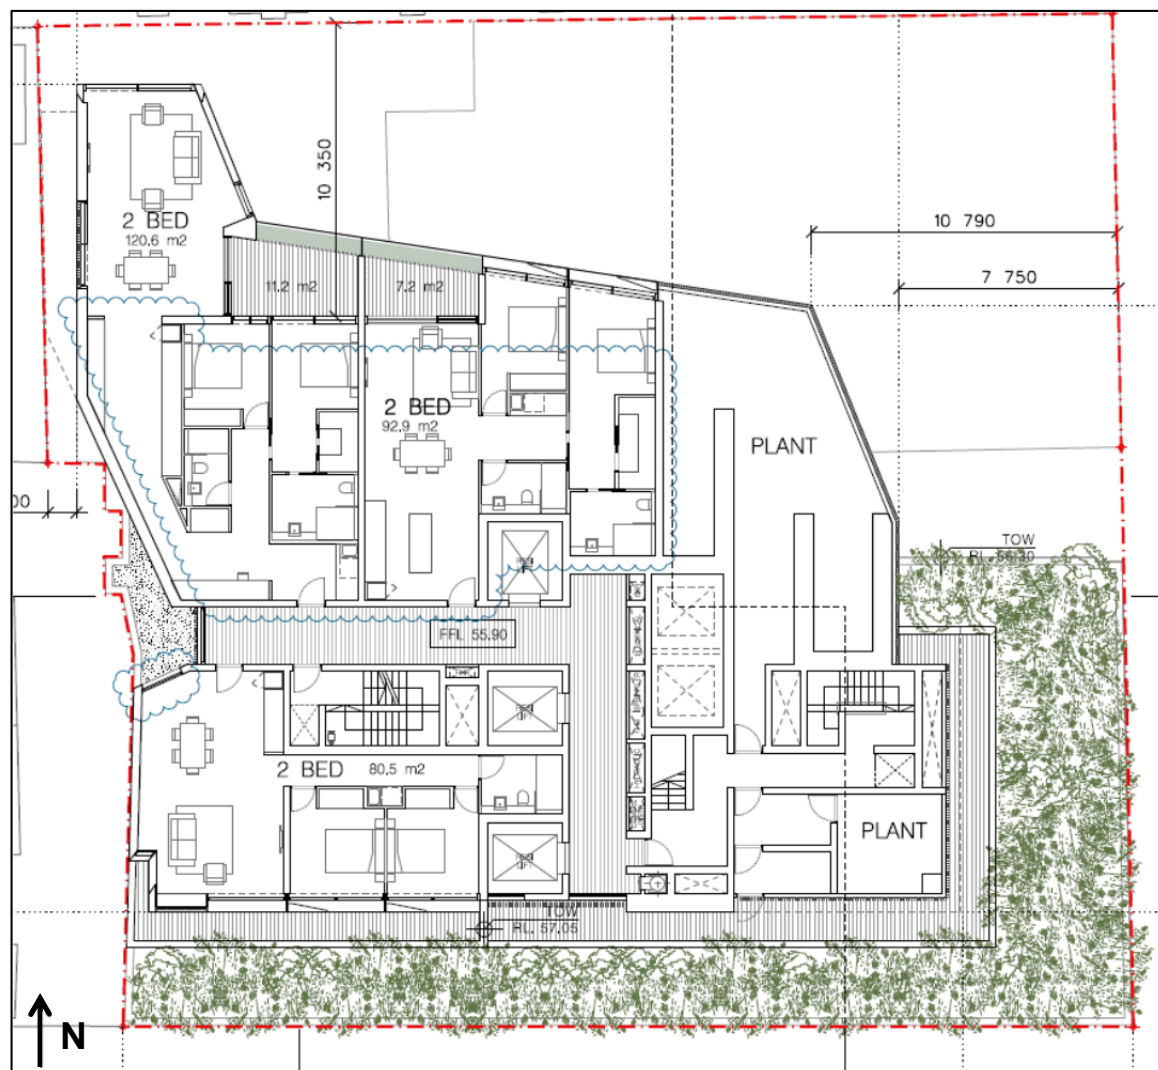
The existing Level 9 floor plan, illustrating the proposed plant and green roof.
